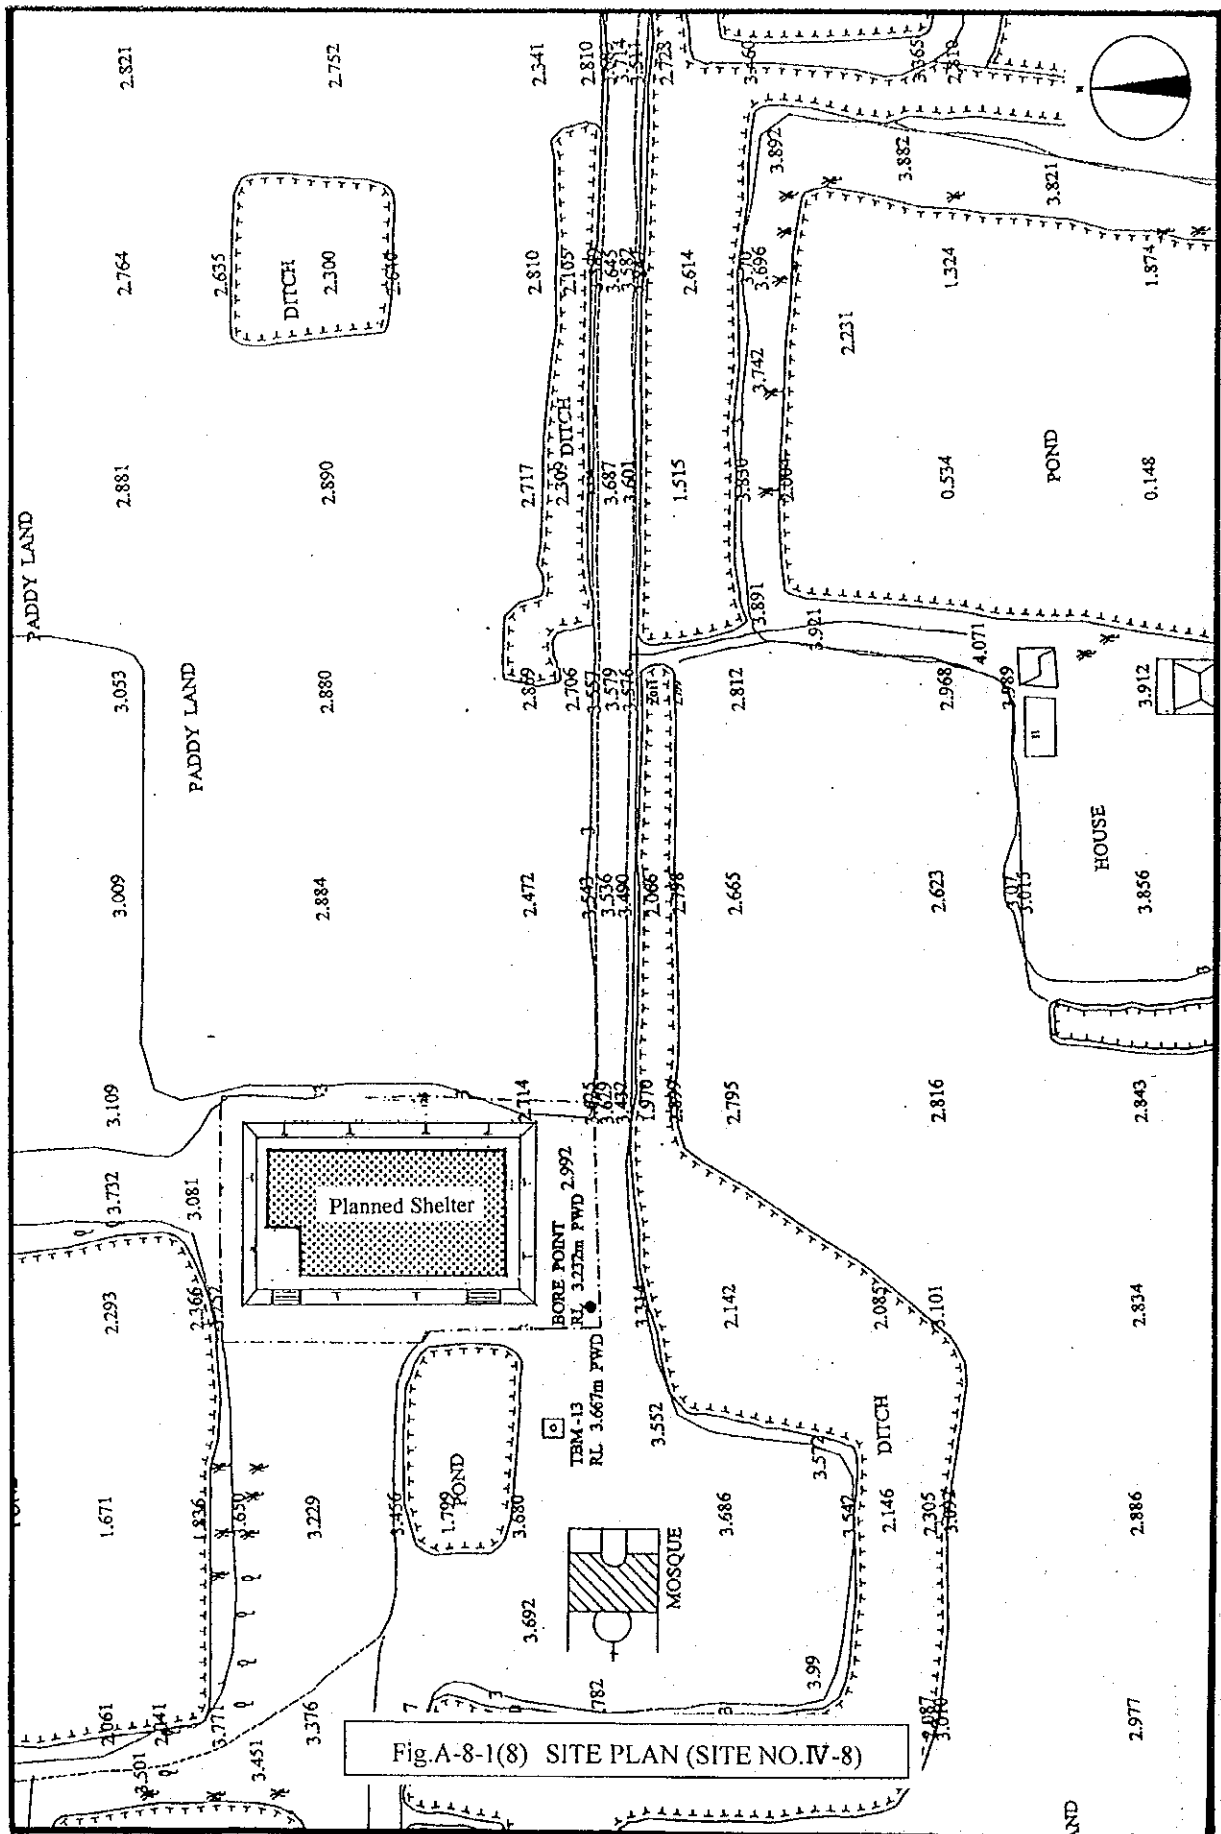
(8) SITE PLAN (SITE NO. IV-8)
